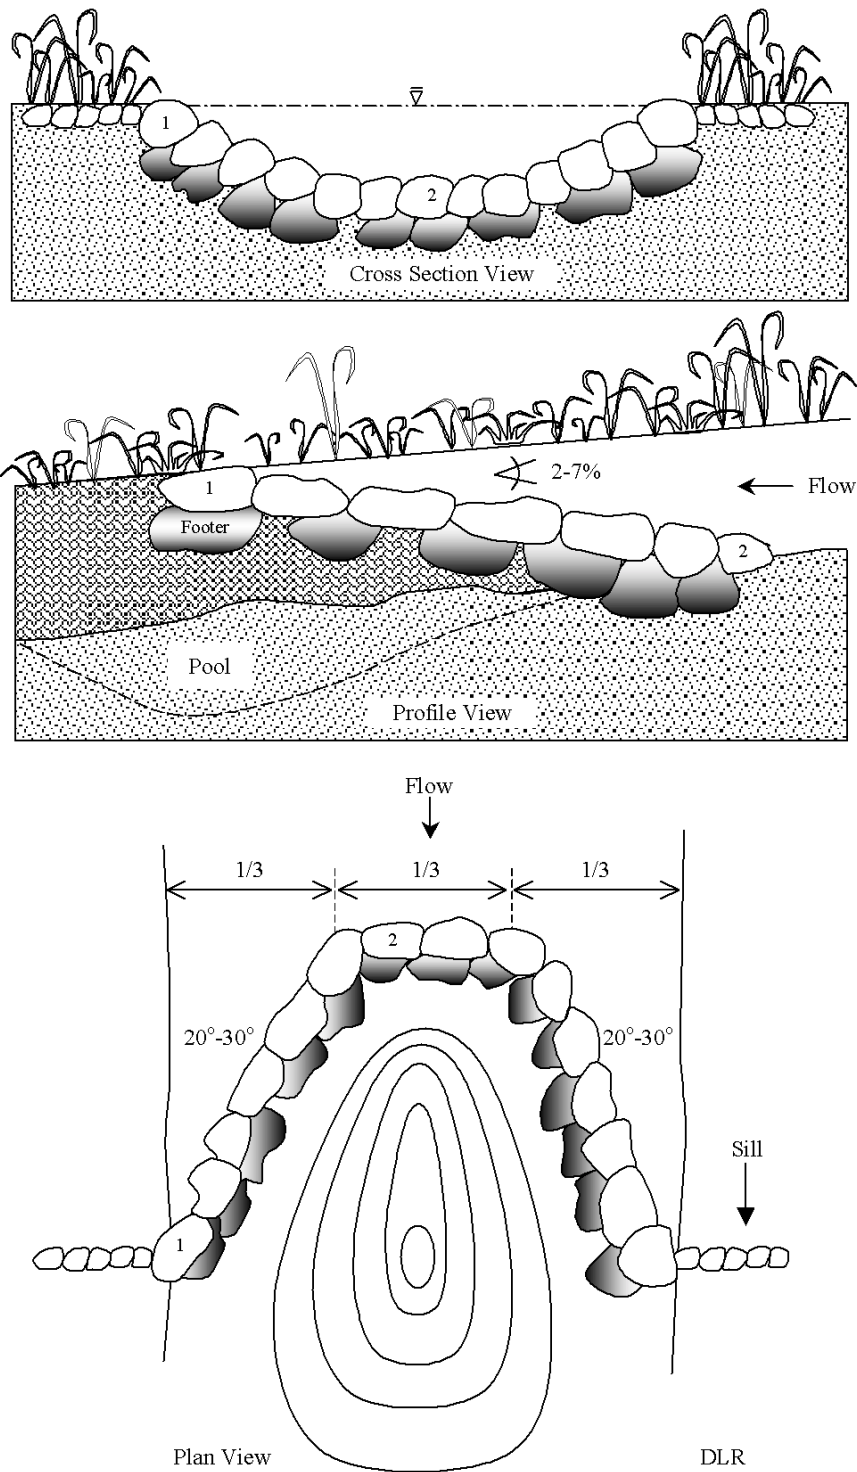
Conceptual section, profile and plan of grade control weir.
